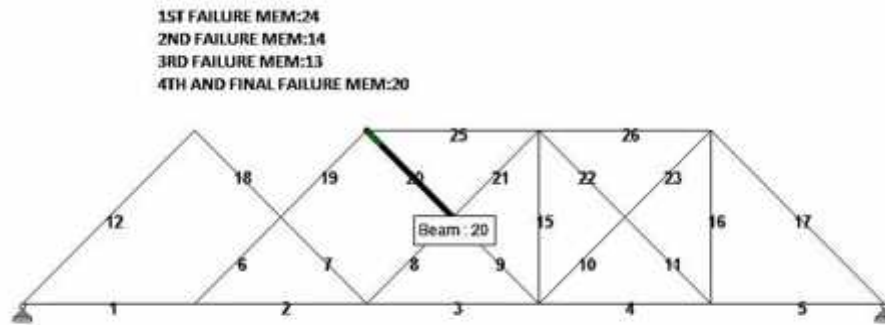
Geometrical configuration of the truss after failure of first three elements having minimum RI i.e element no 24 and 14 and 13.
